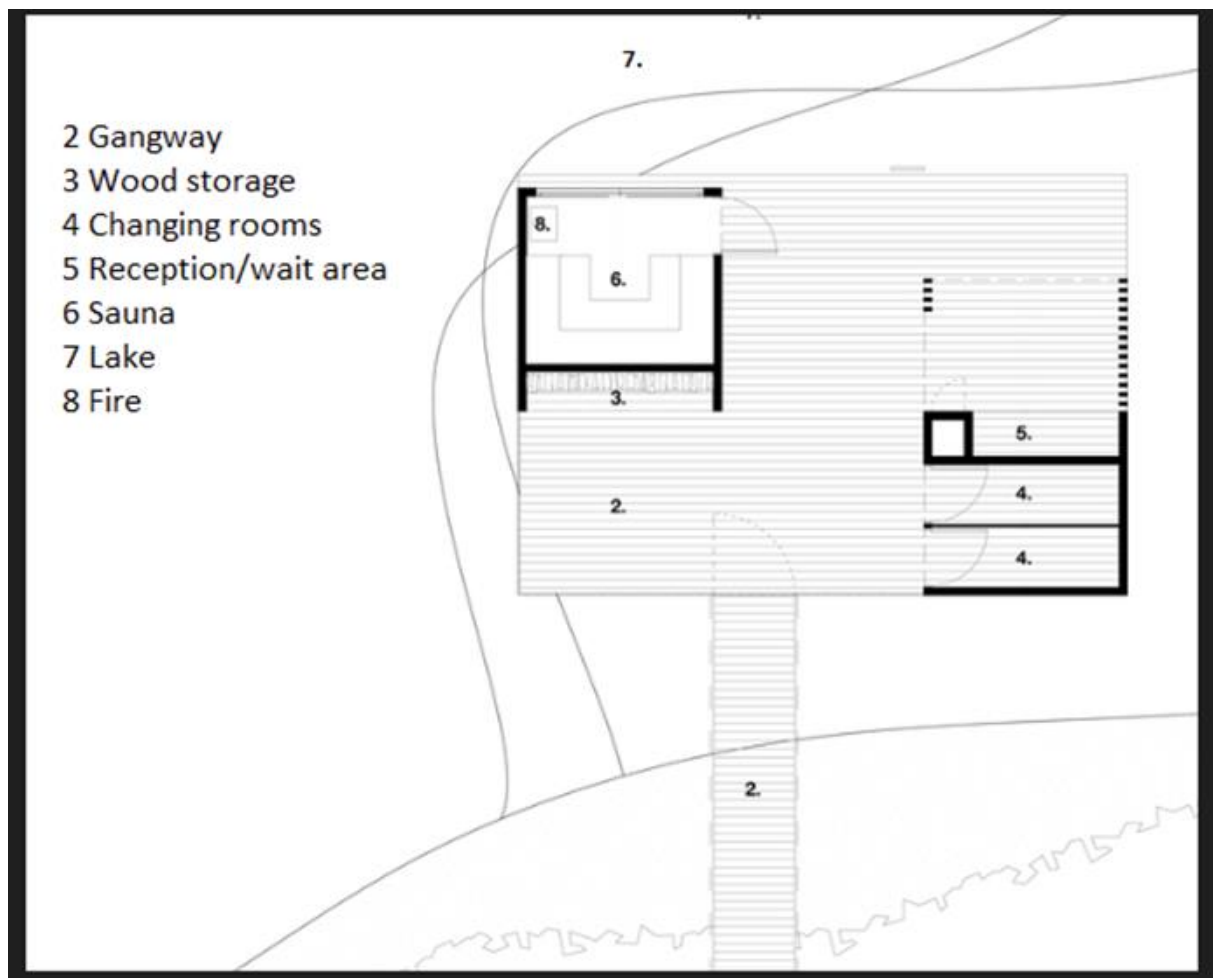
Example 2 of proposed floor plan for floating sauna building. (Source: NCA)
